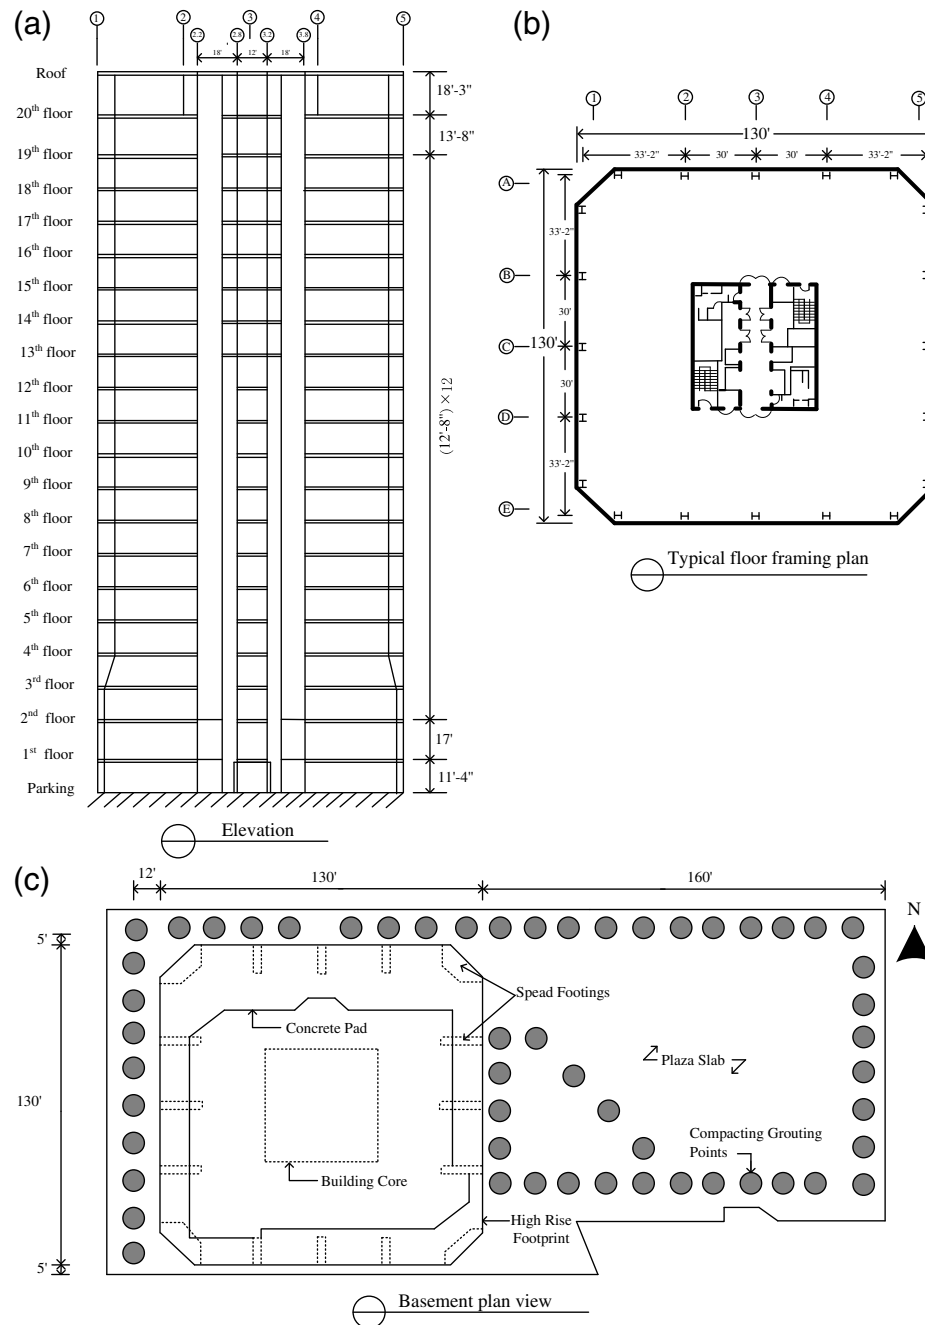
(a) Elevation, (b) typical floor plan, and (c) basement plan of the Atwood Building; units are in feet and inches.
